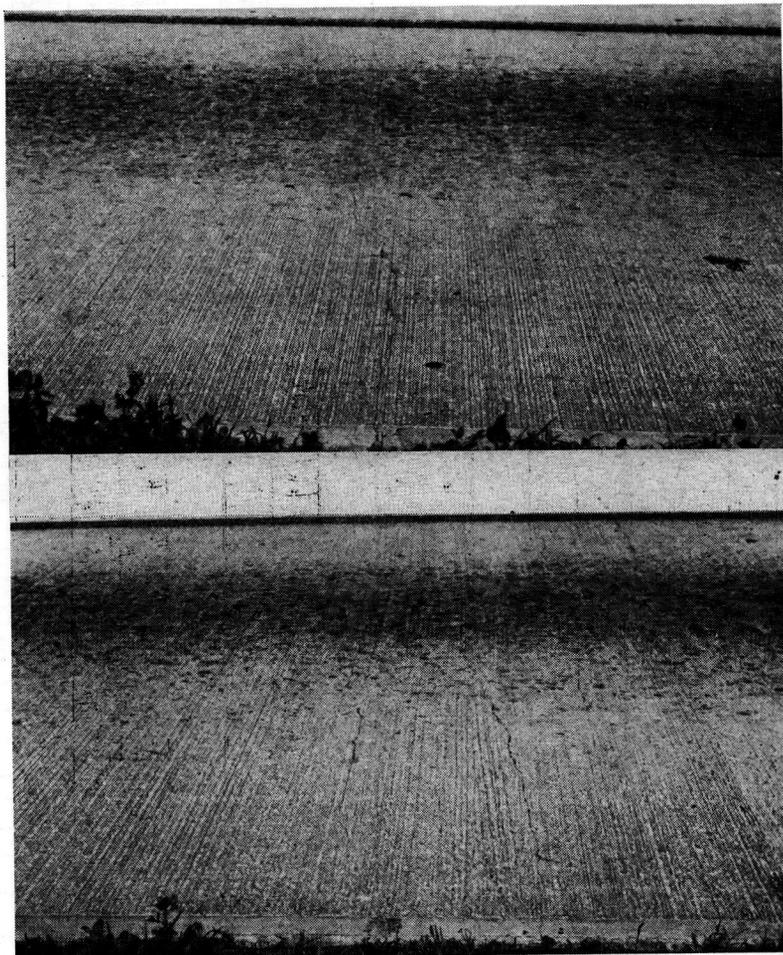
Surface Condition of Pavement in Vicinity of the Widest Cracks Observed in the Central Portion of the Heavily Reinforced Sections. Heavily Traveled Lane After 7 Years of Service
